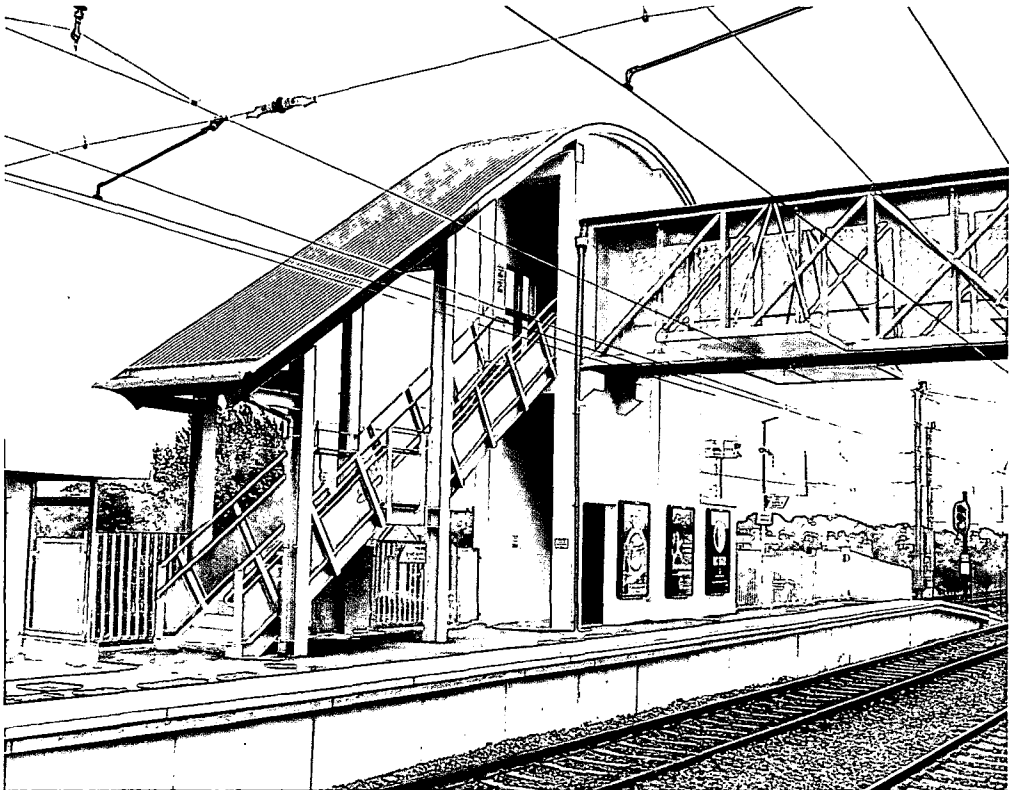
Clontarf Road Station (Ireland) - foot bridge
